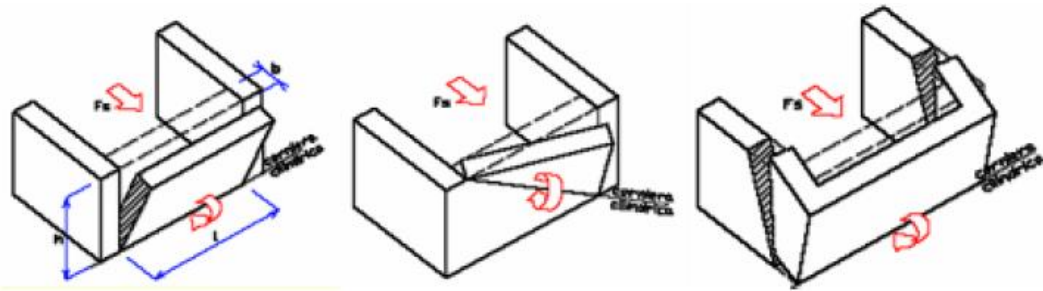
Overturning mechanisms. From left to right: simple overturning, partial overturning and composite overturning (Borri, 2004c)
